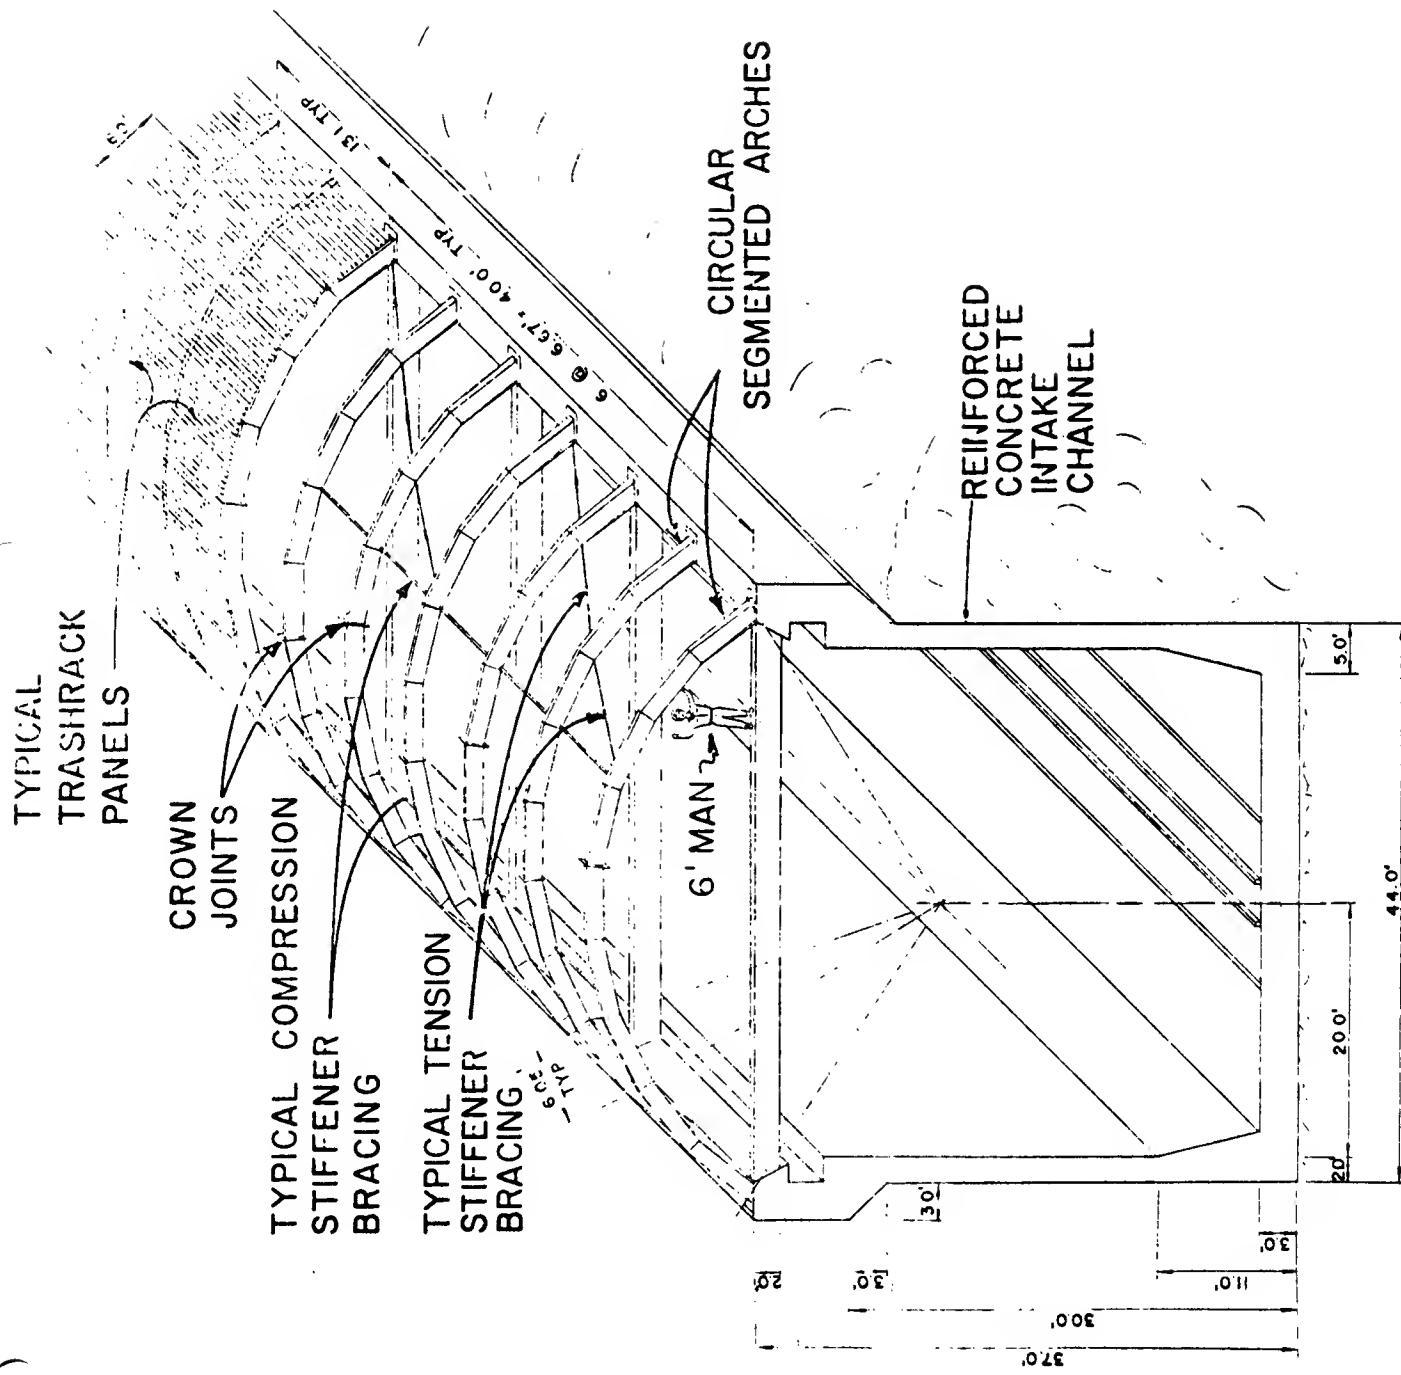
(Drawing) Typical Intake Structure Section and Trashrack System
